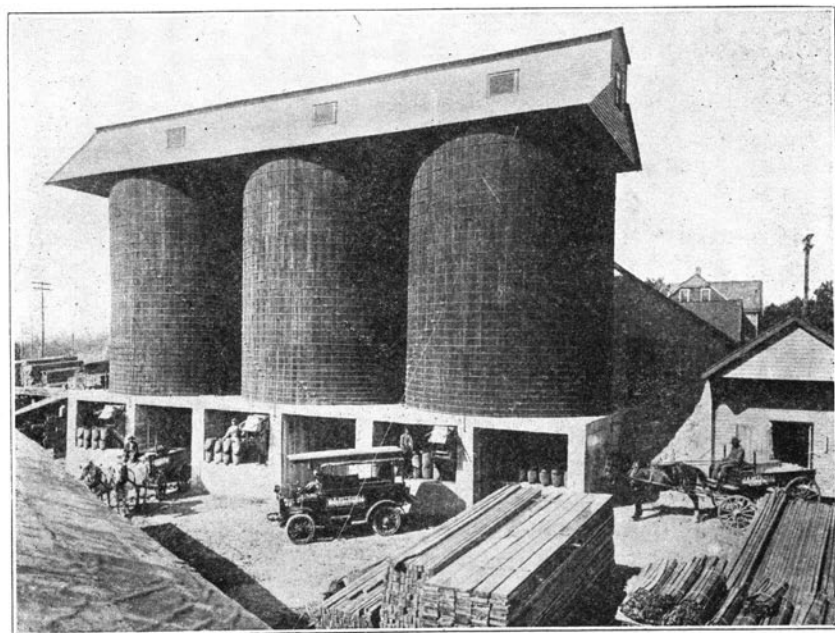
WOODEN STAVE SILO COAL STORAGE PLANT, ARRANGED FOR BOTTOM DISCHARGE
